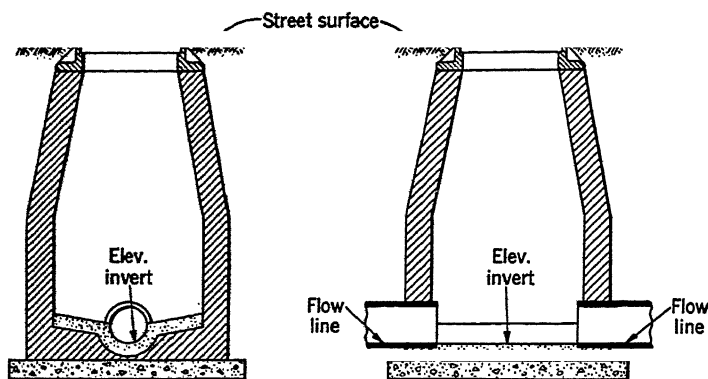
Cross sections of a typical manhole showing invert and flow line.
